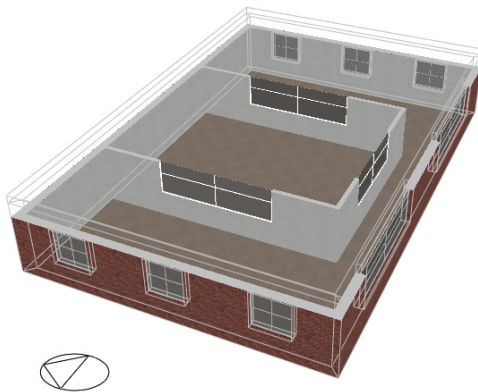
Preliminary NTED™ design showing core and perimeter areas (Source: Pressnail, et al., 2008).
